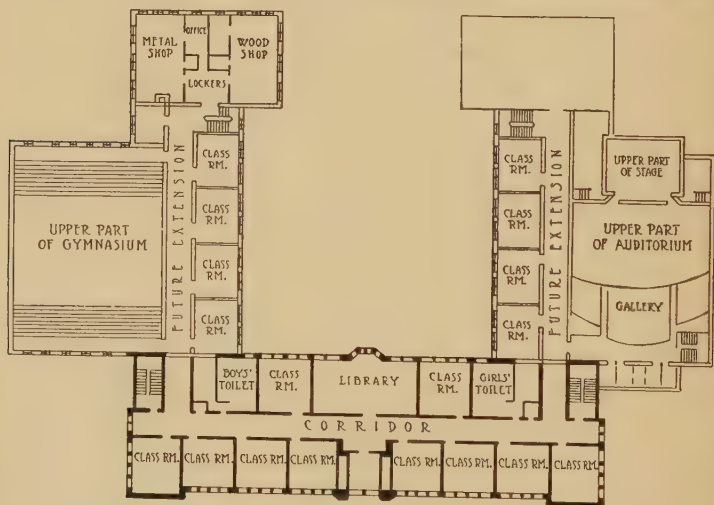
Second-floor plan, Roosevelt Junior High School,
